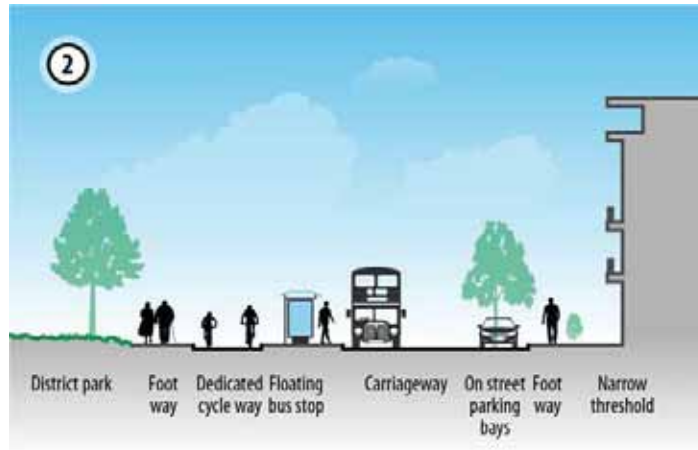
Indicative Street Section 2: Primary Street overlooking Ashton District Park.
